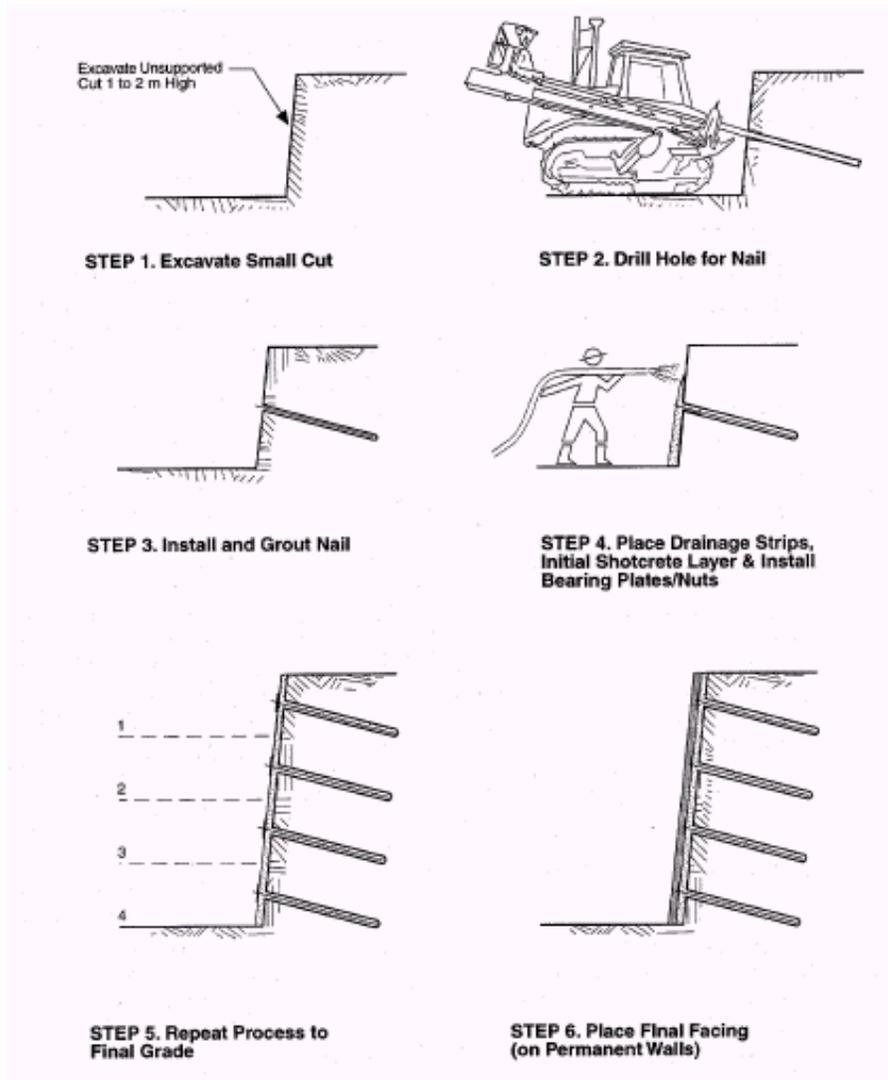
Soil Nail Wall Construction Sequence (FHWA, 1996)
